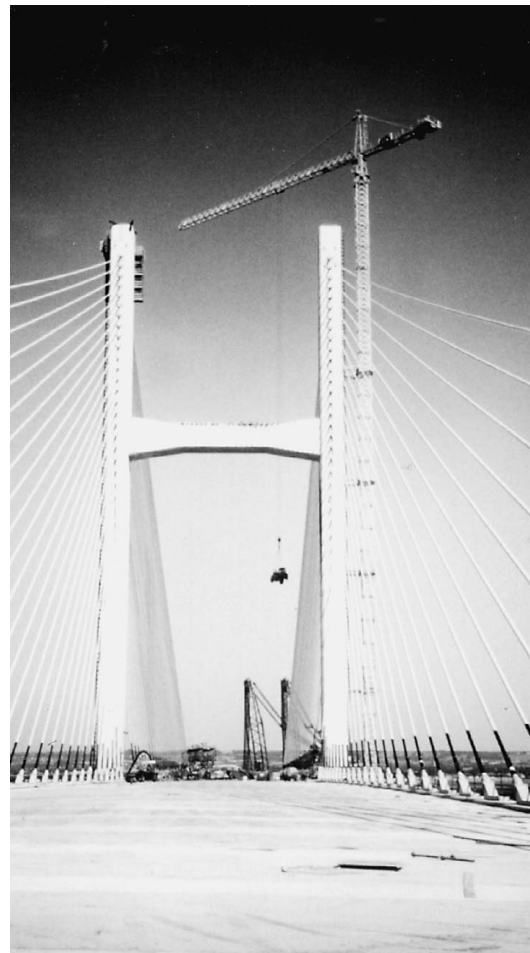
The cable-stayed bridge of the Second Severn Crossing.
